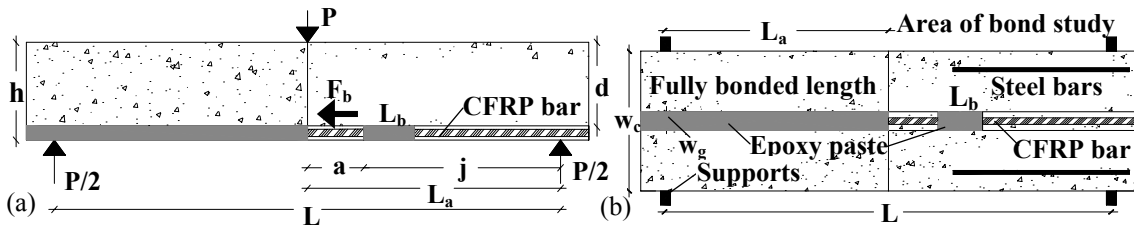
Geometrical characteristics of beam specimens: (a) side view and (b) plan view.
